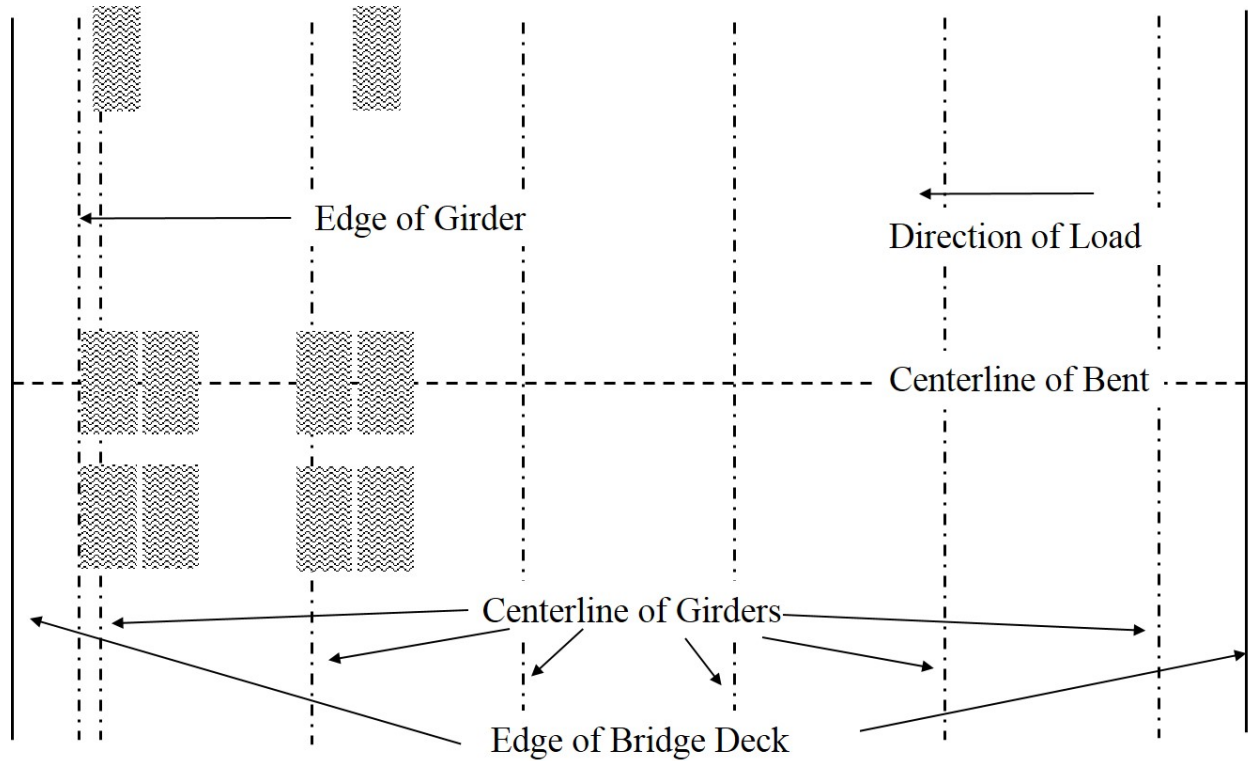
Placement of Load Truck on U.S. Highway 331 Bridge Deck
